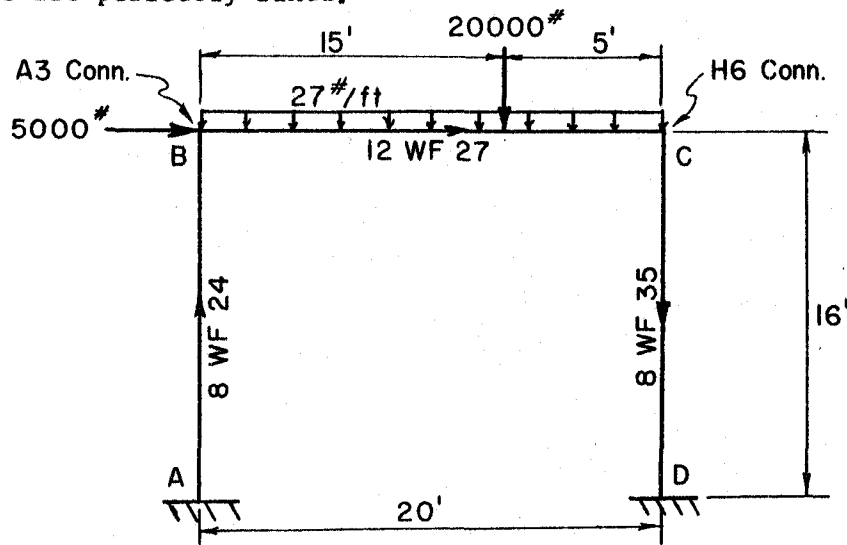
SINGLE BAY, ONE STORY PORTAL FRAME
